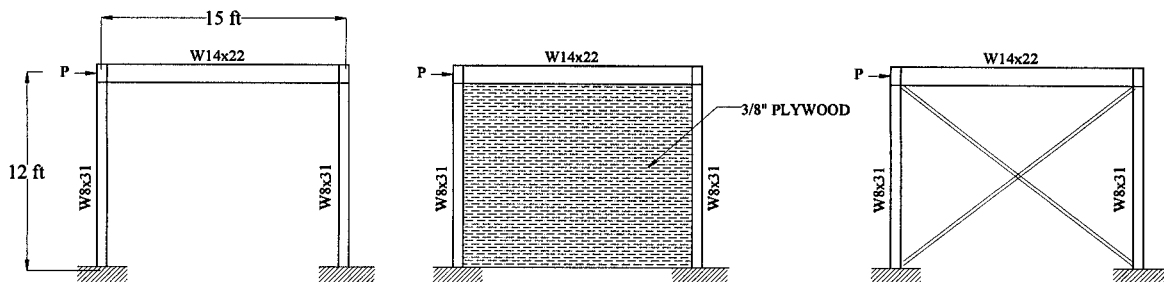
Modeling the Effect of Wood Diaphragm Walls
